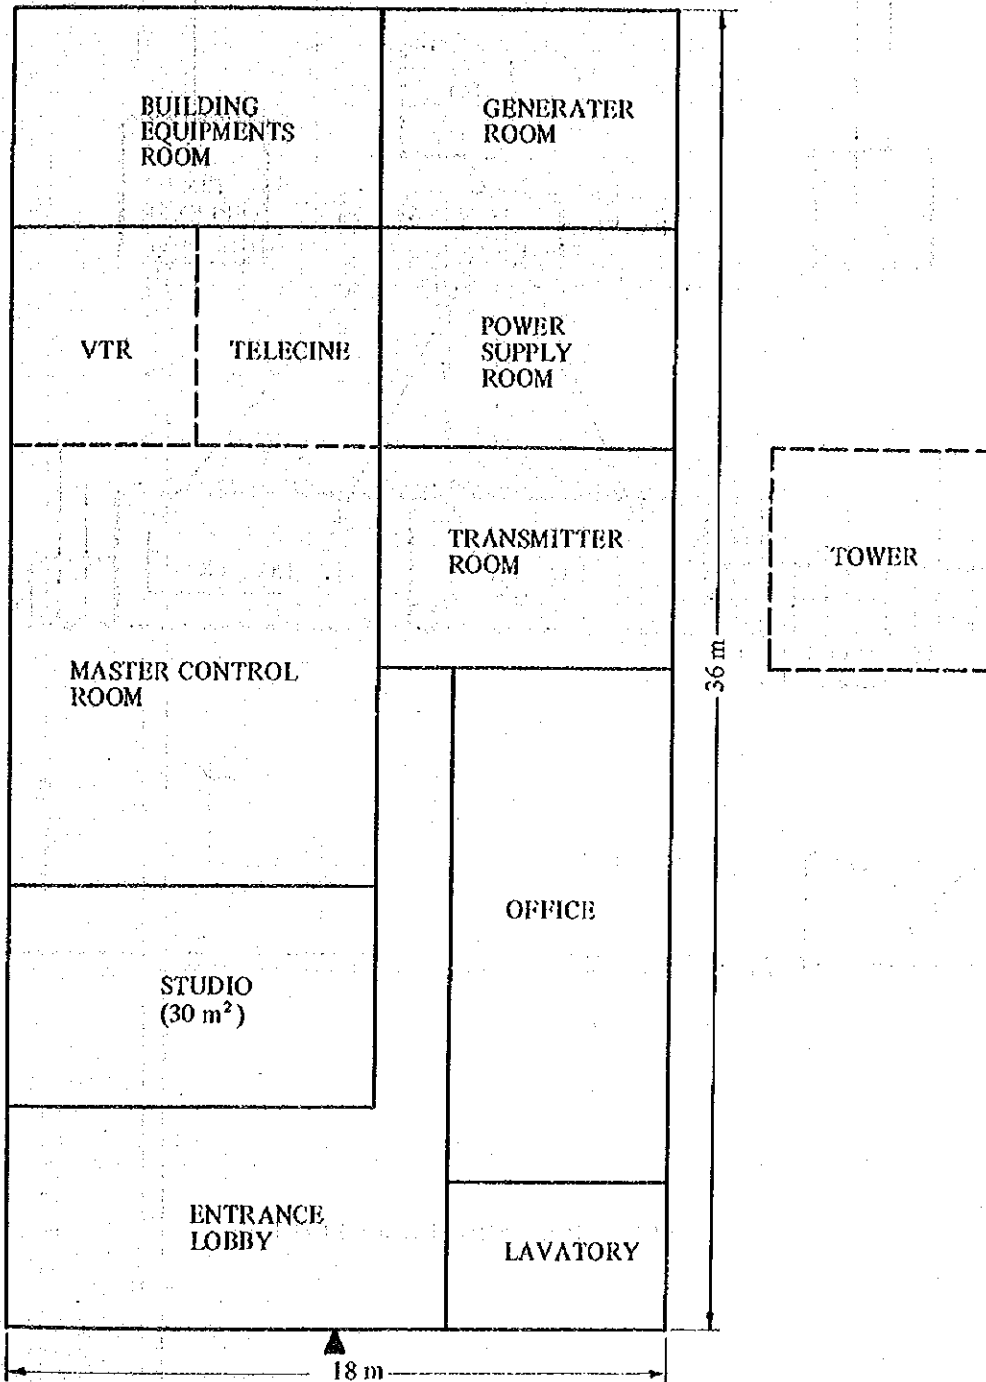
Floor Layout of General Region Studio Building (An Example)
